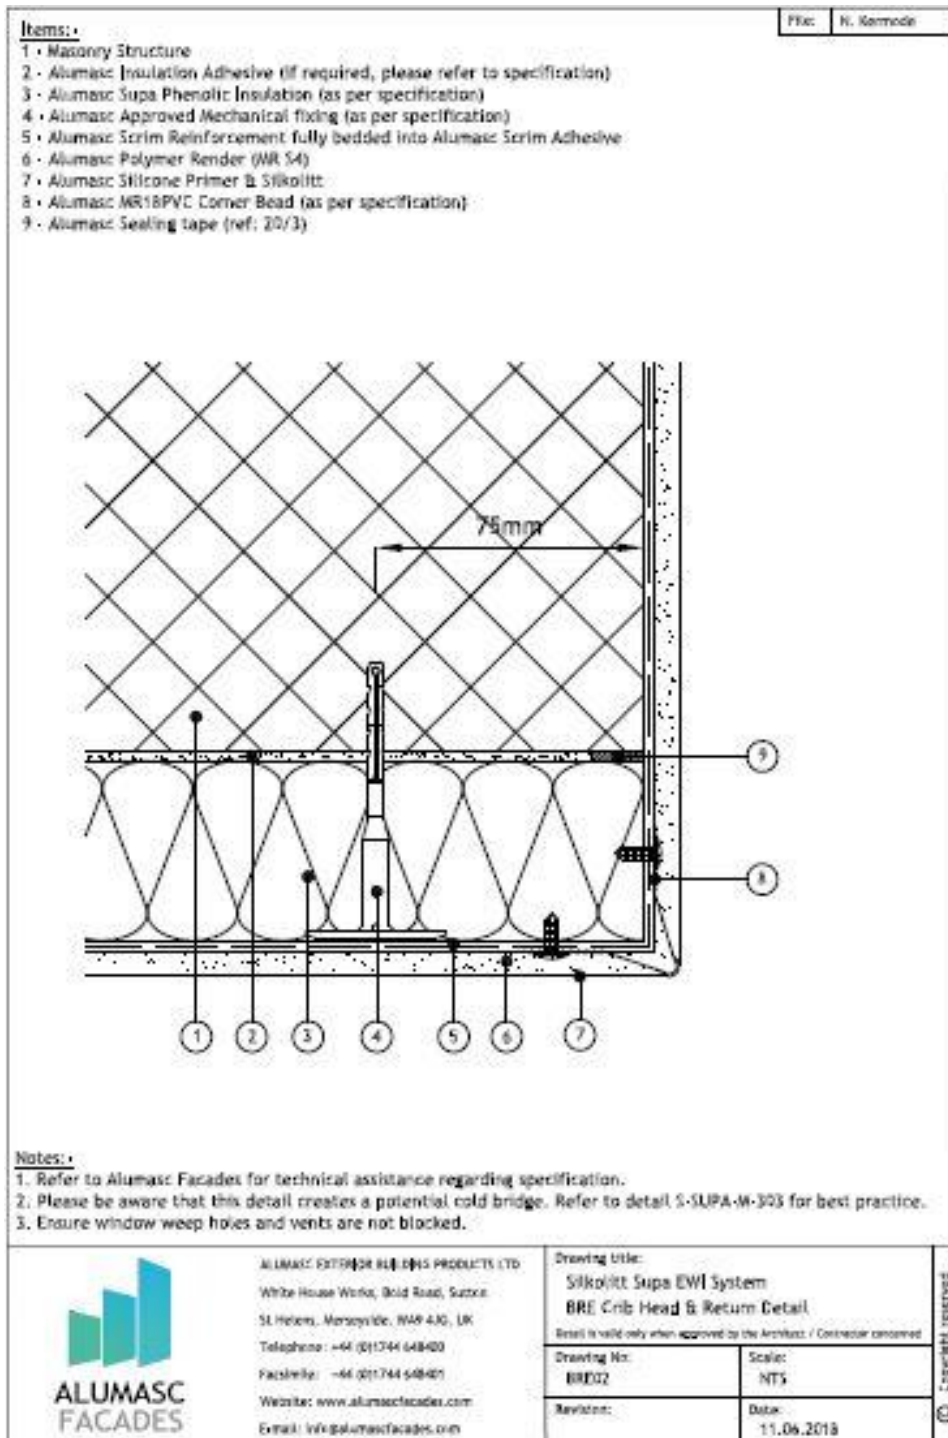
Cross-section: combustion chamber head detail (supplied by Test Sponsor).
